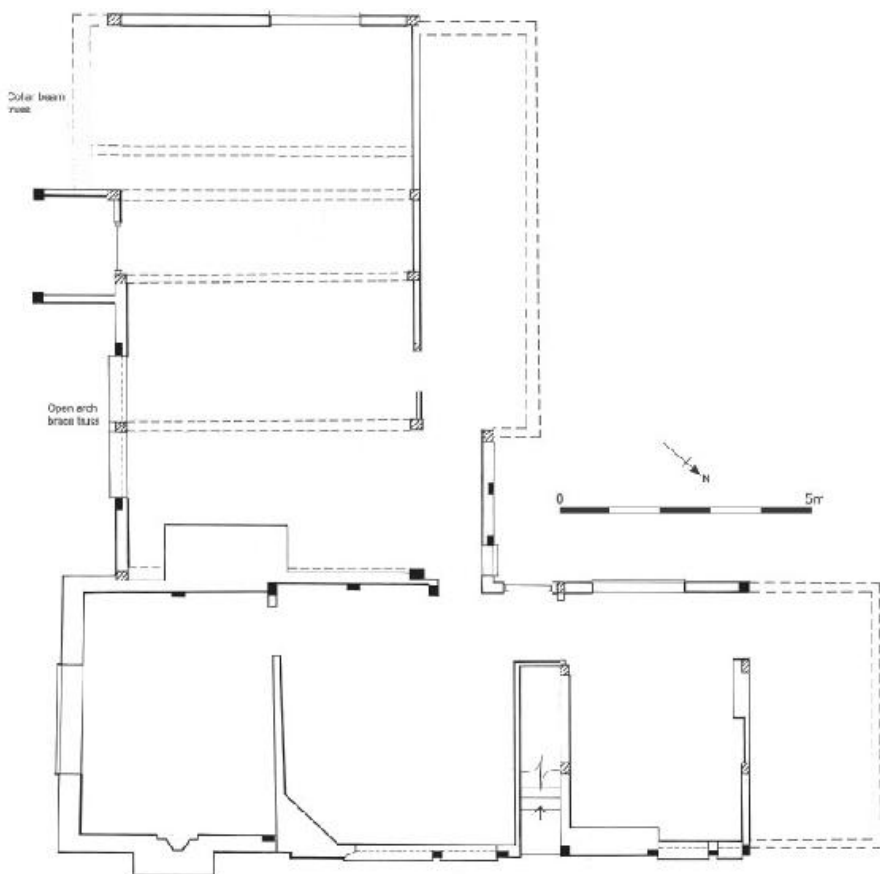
Ground-floor plan of Pool Farm. The porch identifies the line of the cross-
